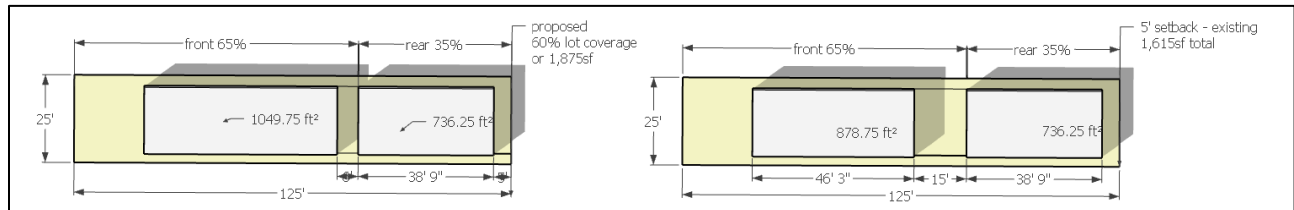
Comparison between proposed (left) and existing (right) allowed building coverage on 25'x125' zone lot
